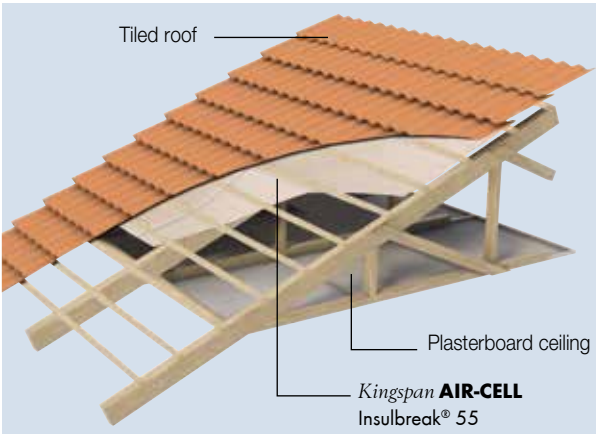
Kingspan AIR-CELL Insulbreak® 55 in a tiled roof with an attic space and a flat ceiling
